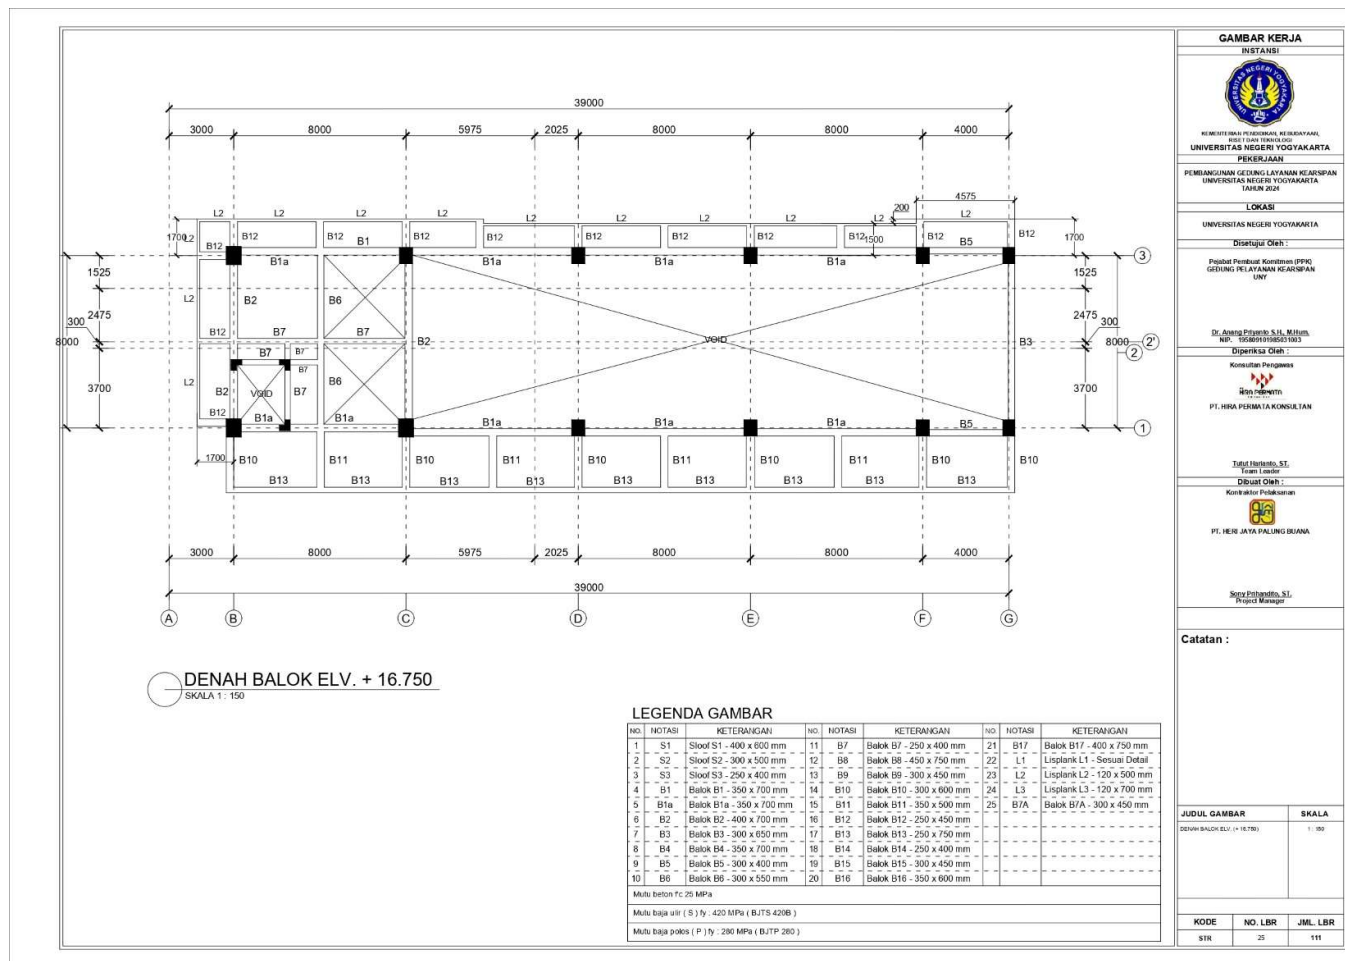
9 Beam Site Plan of Elv. +16.750
